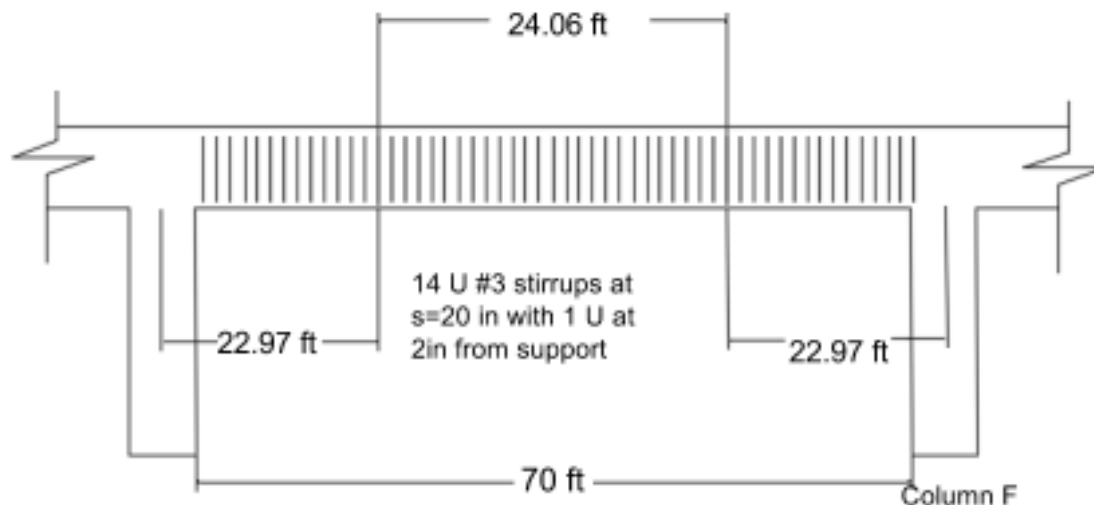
Shear Reinforcement for T Beam Between Column E and F. Note: figure not to scale.
